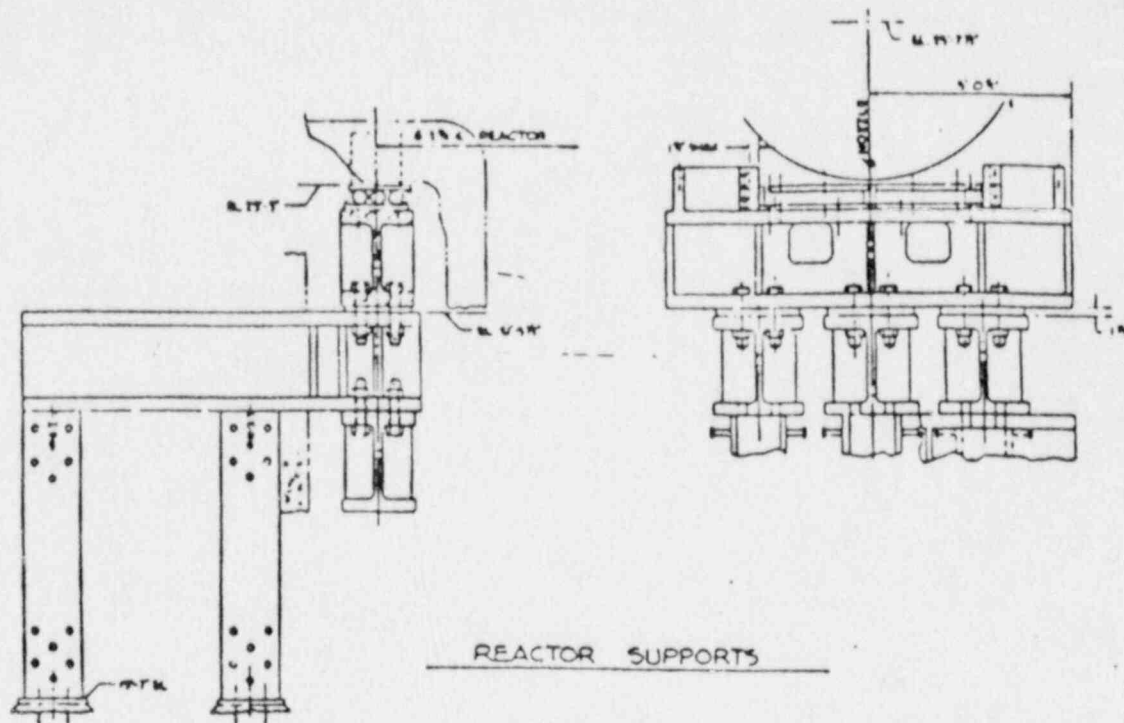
Details of a PWR-vessel short-column support resting on cantilever beam.
